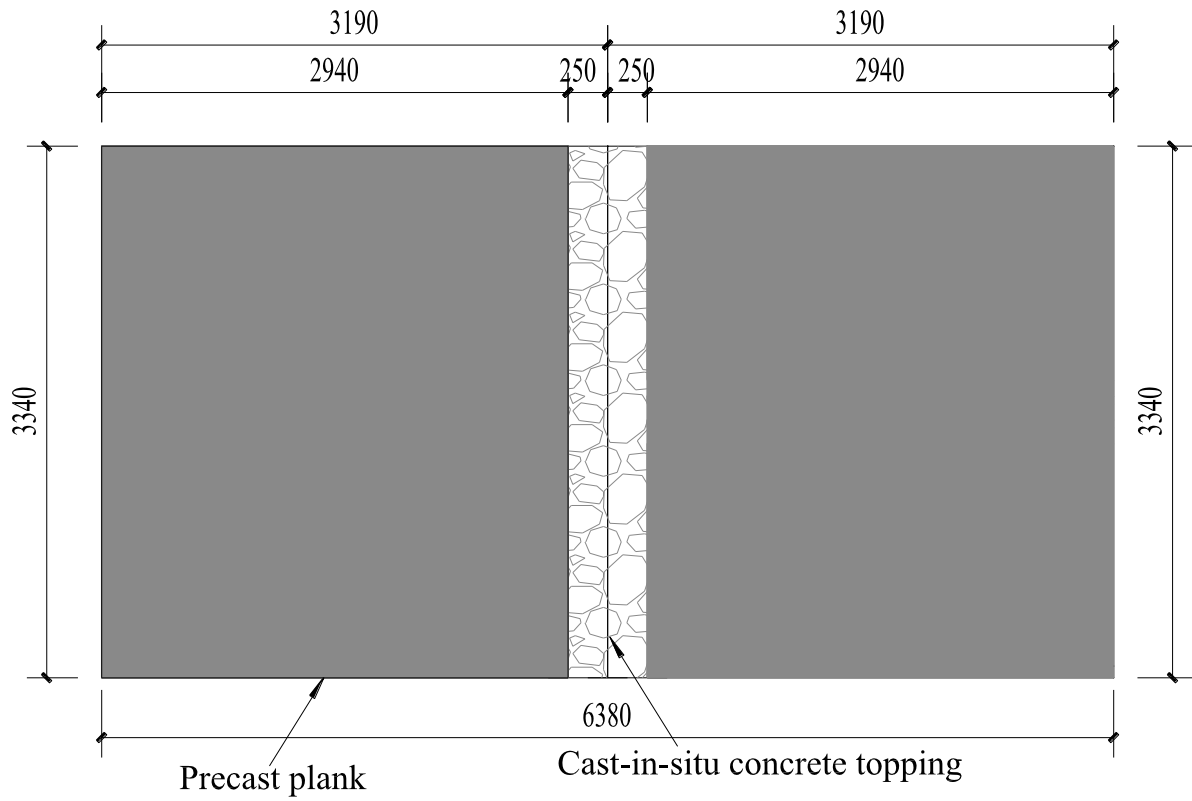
Geometric dimensions of the composite slab with a separated joint.
